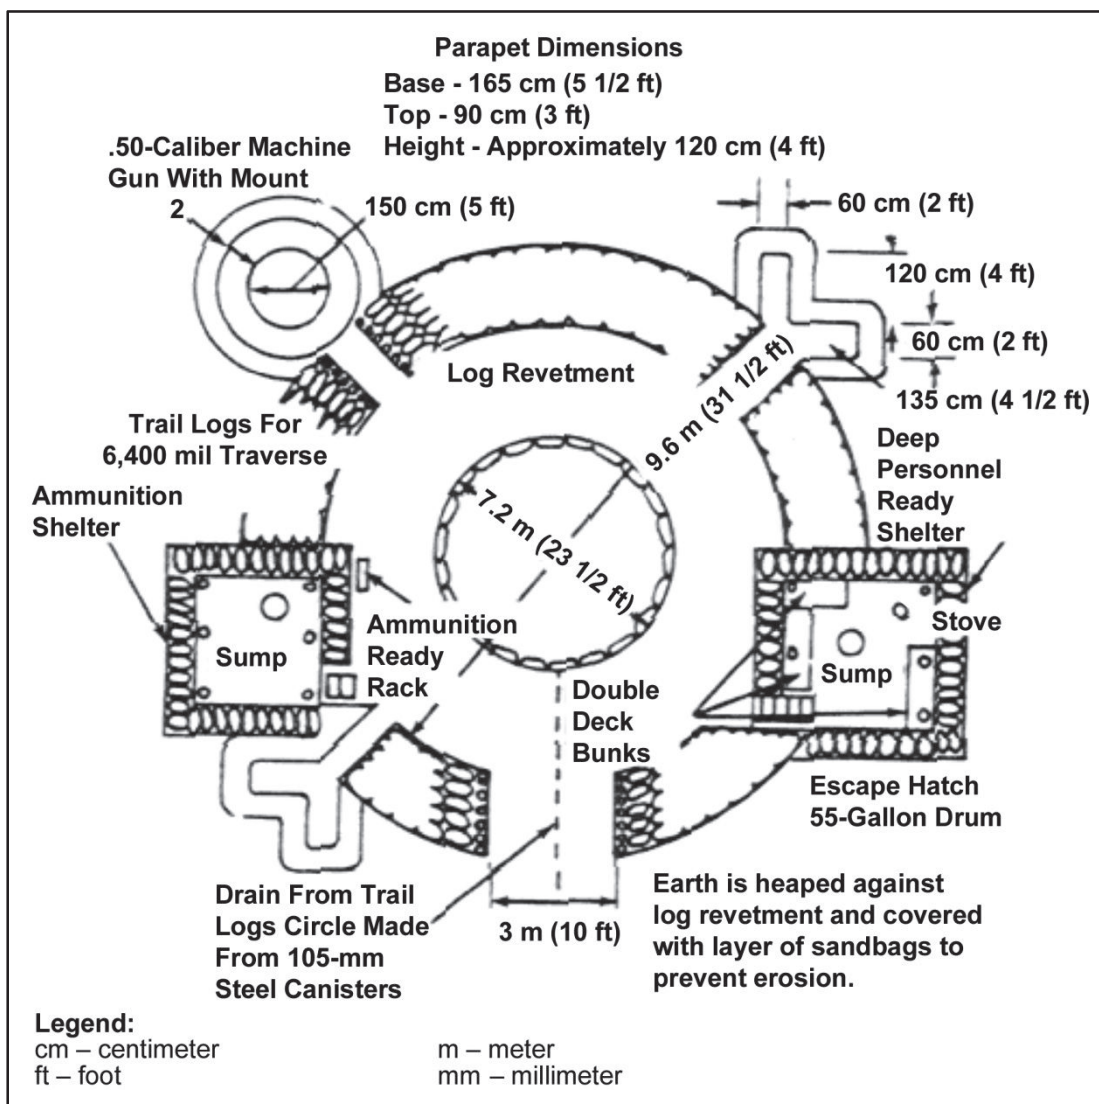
Towed howitzer emplacement (105-millimeter and 155-millimeter howitzer) completed emplacement
